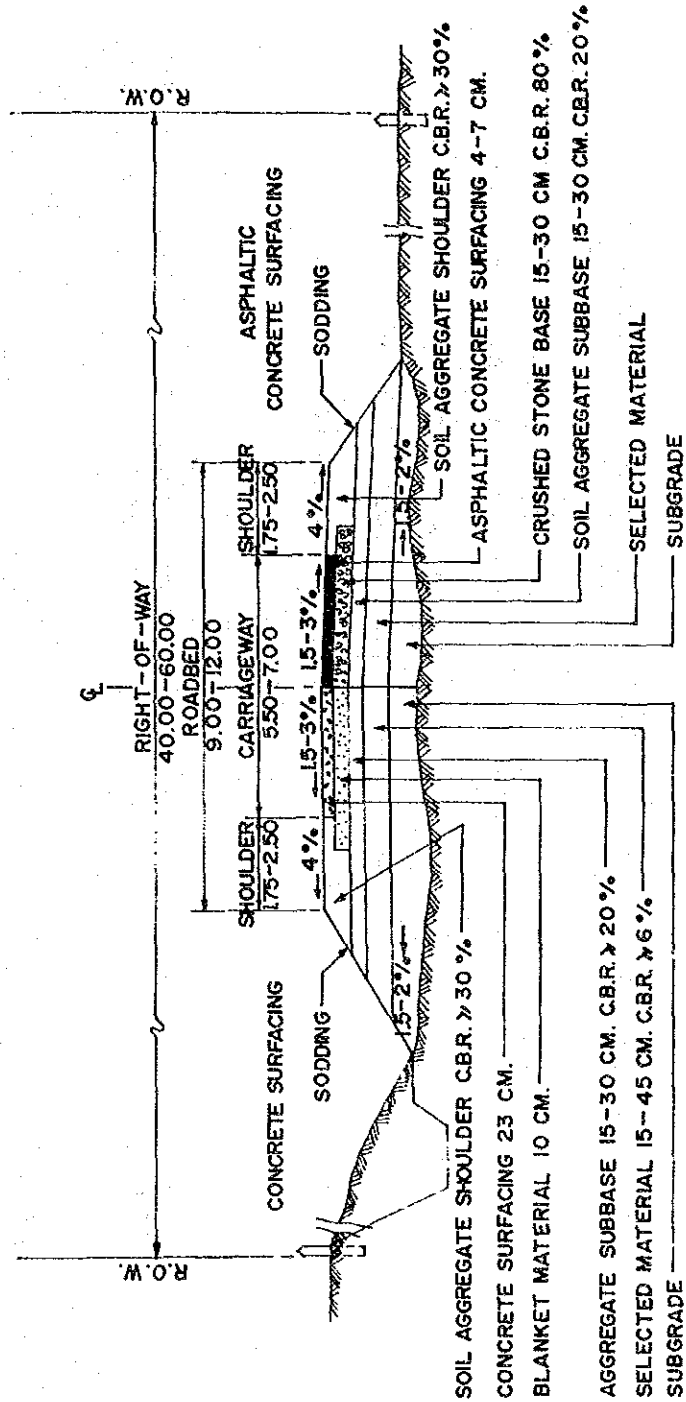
TYPICAL CROSS SECTION OF SECONDARY HIGHWAY
